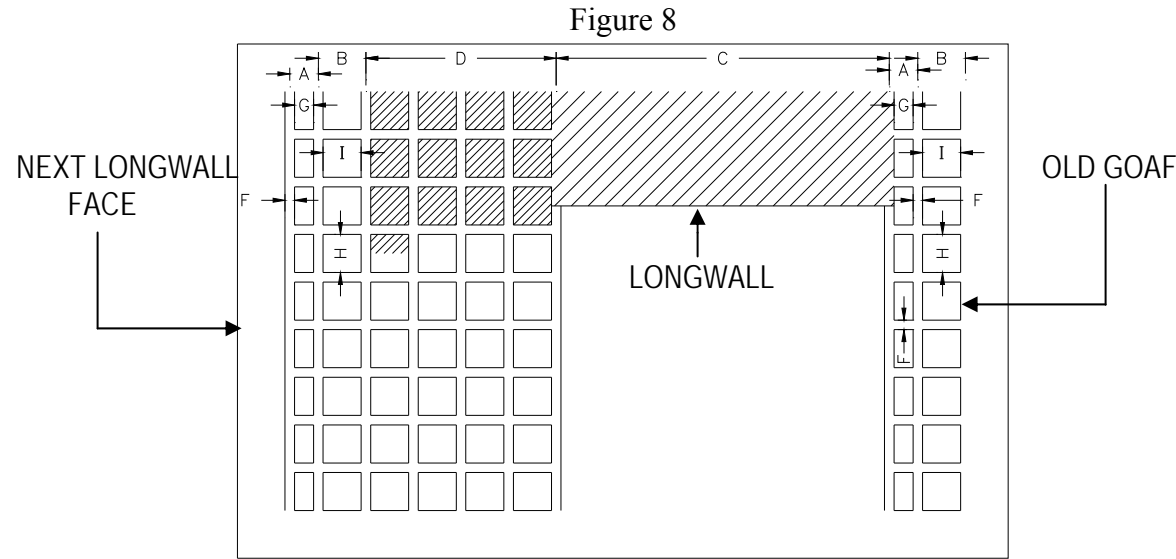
Layout of a suggested section combining a block system and a retreating longwall. Dimensions are given in Table 3.
